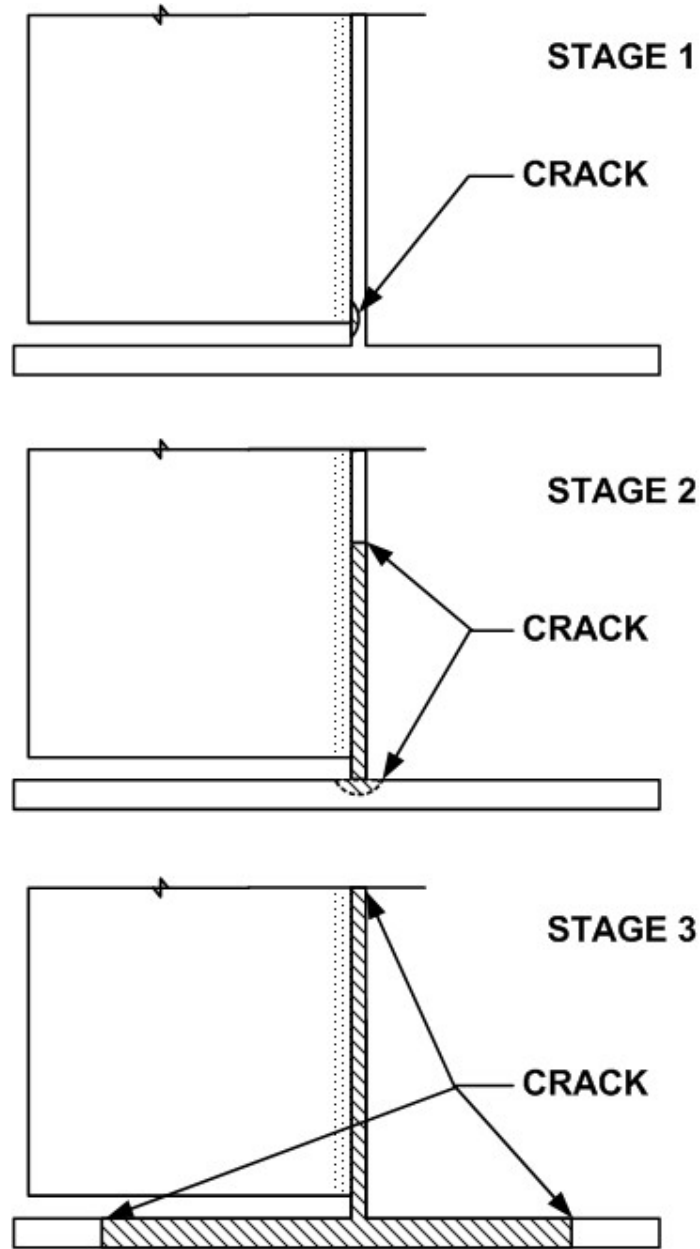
Crack Growth at Transverse Stiffener to Web and Flange
